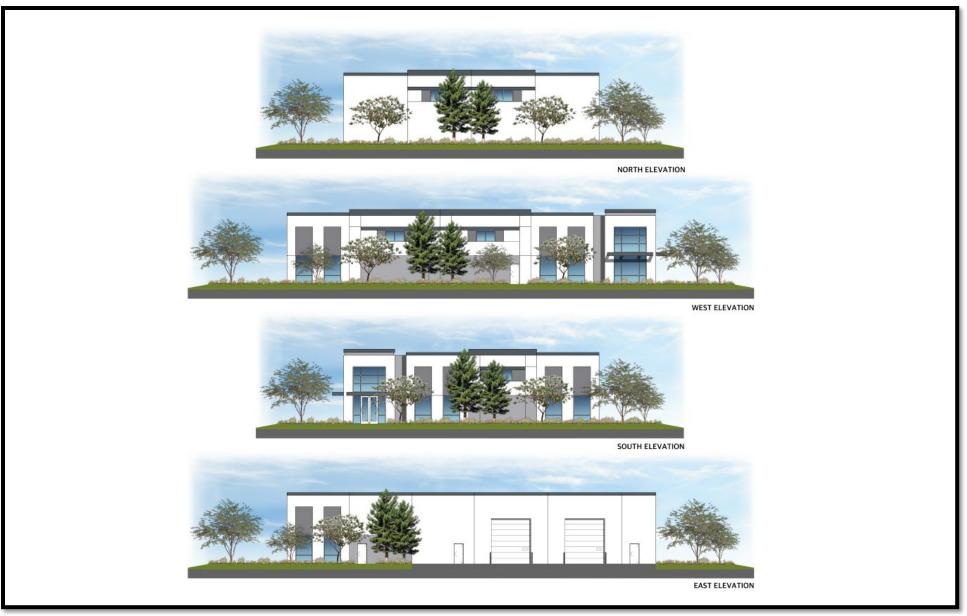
Building Elevations and Profiles Source: SKH Architectural Design
